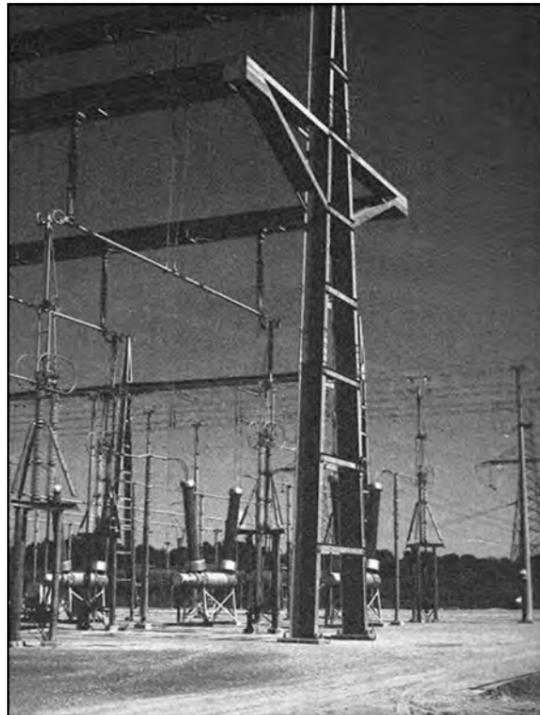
Utility tower foundations (Courtesy of Hubbell, Inc.)
